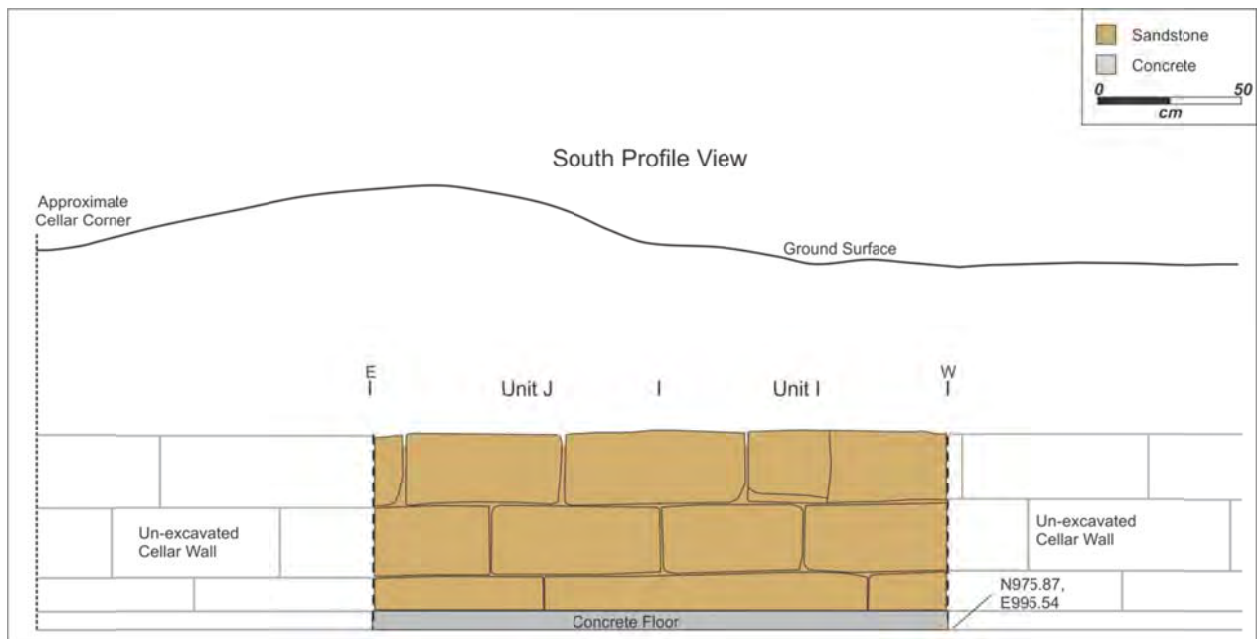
Illustration of the foundation wall (Units I-J) within Ruby Hollow house cellar foundation (Structure #1).
